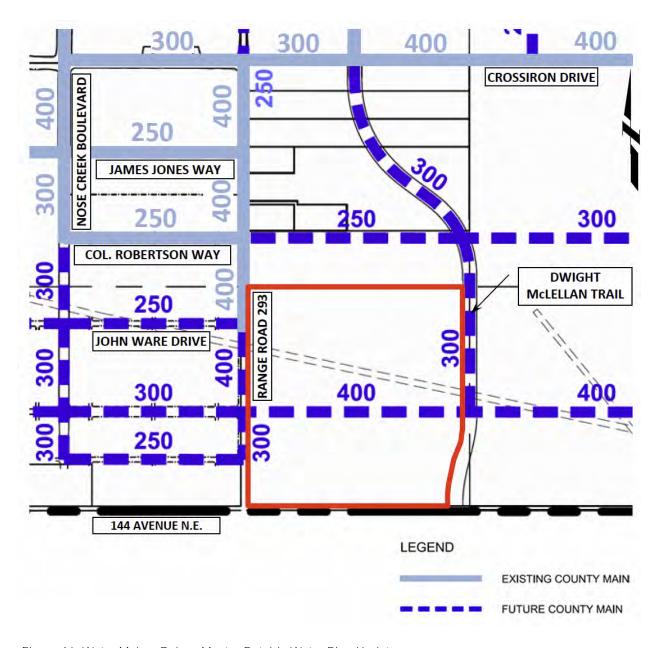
Water Mains, Balzac Master Potable Water Plan Update - (MPE Engineering Ltd. 2014, Adapted by KBES Ltd.)
